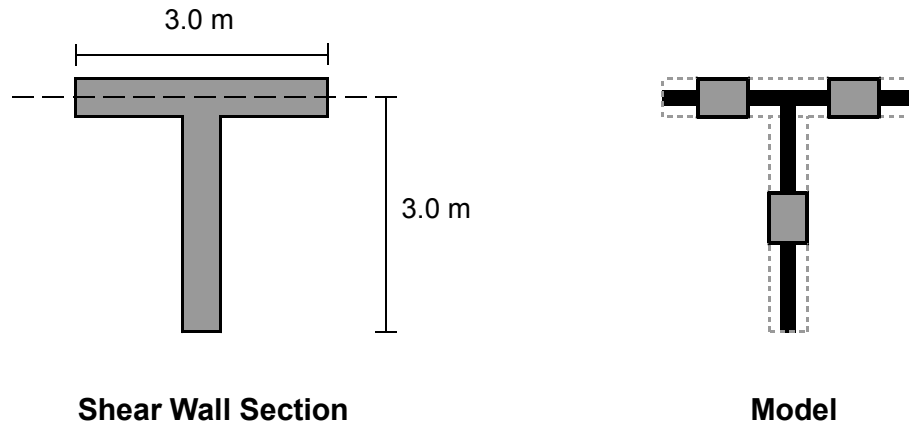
Plan of a T-Shaped Shear Wall Assembly and Its Proposed Model
